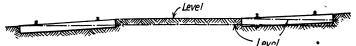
Step Method of Elevating Outer Rail on Curves.
